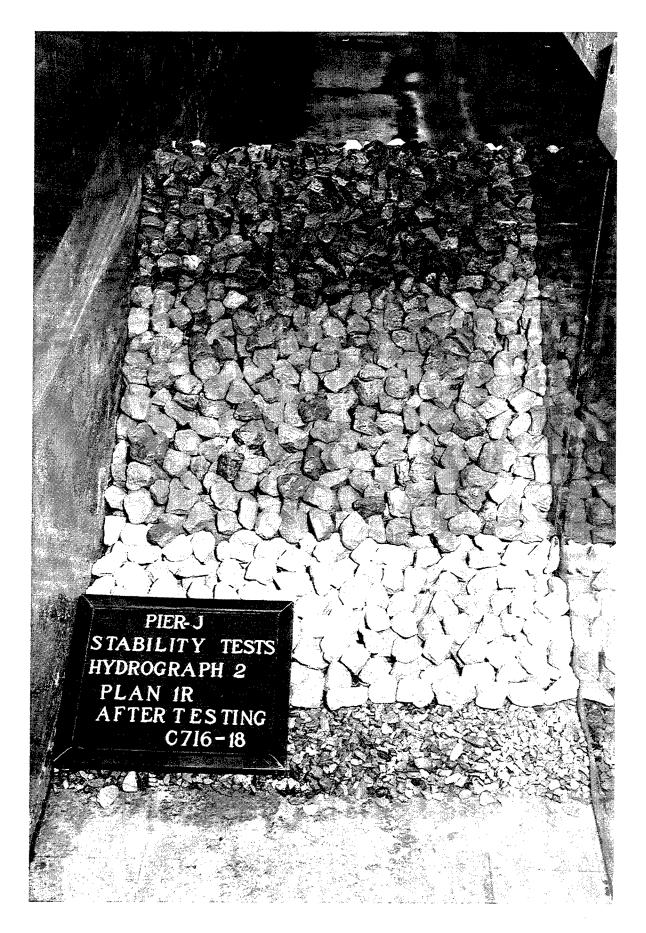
Sea-side view of Plan 1R after testing step 5 of Hydrograph 2
